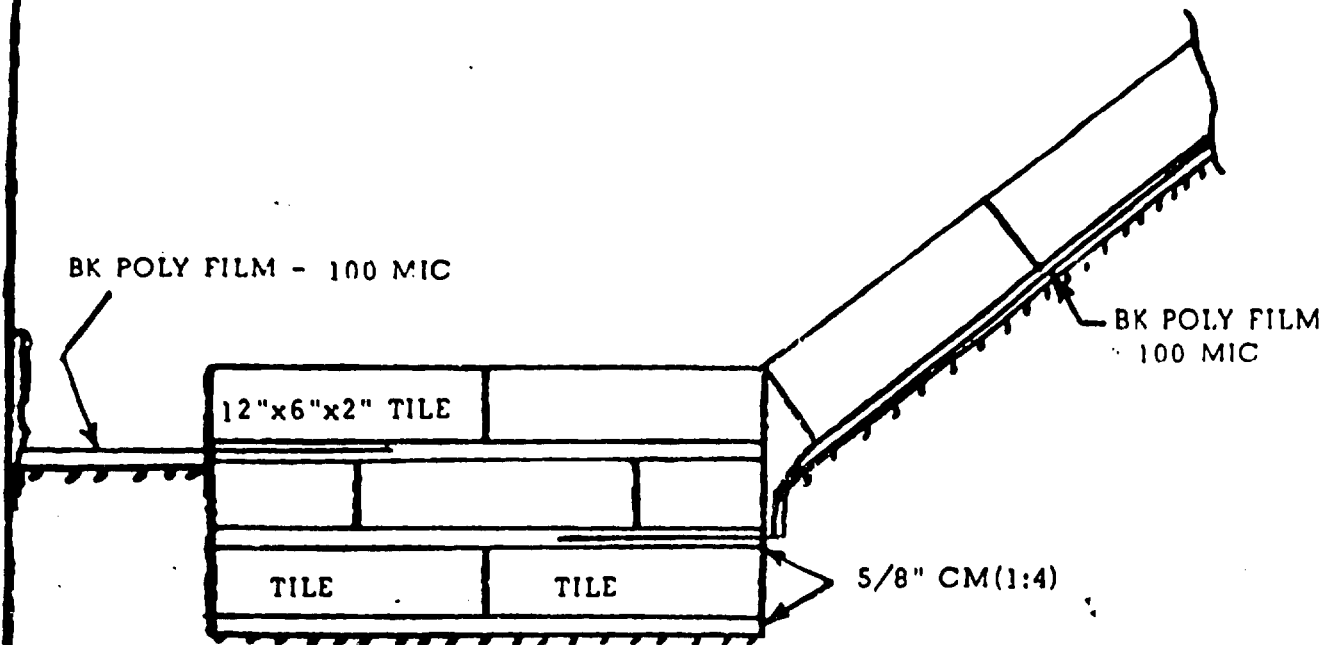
TOE WALL CONSTRUCTION DETAILS
